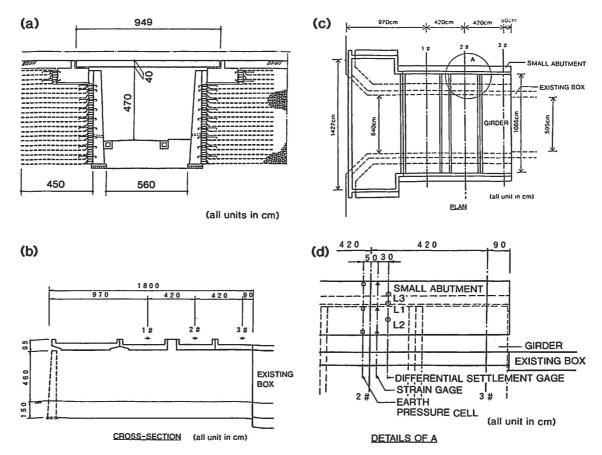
GRS-RW bridge abutments at Hibitsu, Nagoya; (a) front view (Fig. 2 of Tatsuoka et al., 1992), (b) cross-section, (c) plan and (d) close up view of zone A in (c)
